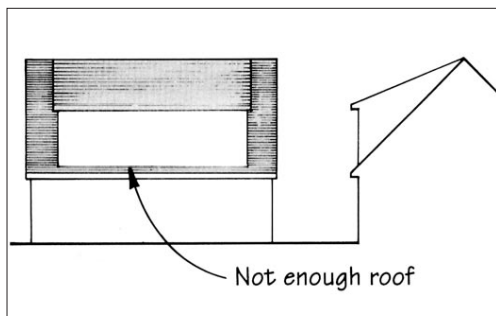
Leaving too little roof below the dormer makes the lower roof look tacked on — but still looks better than cutting the lower roof away.
